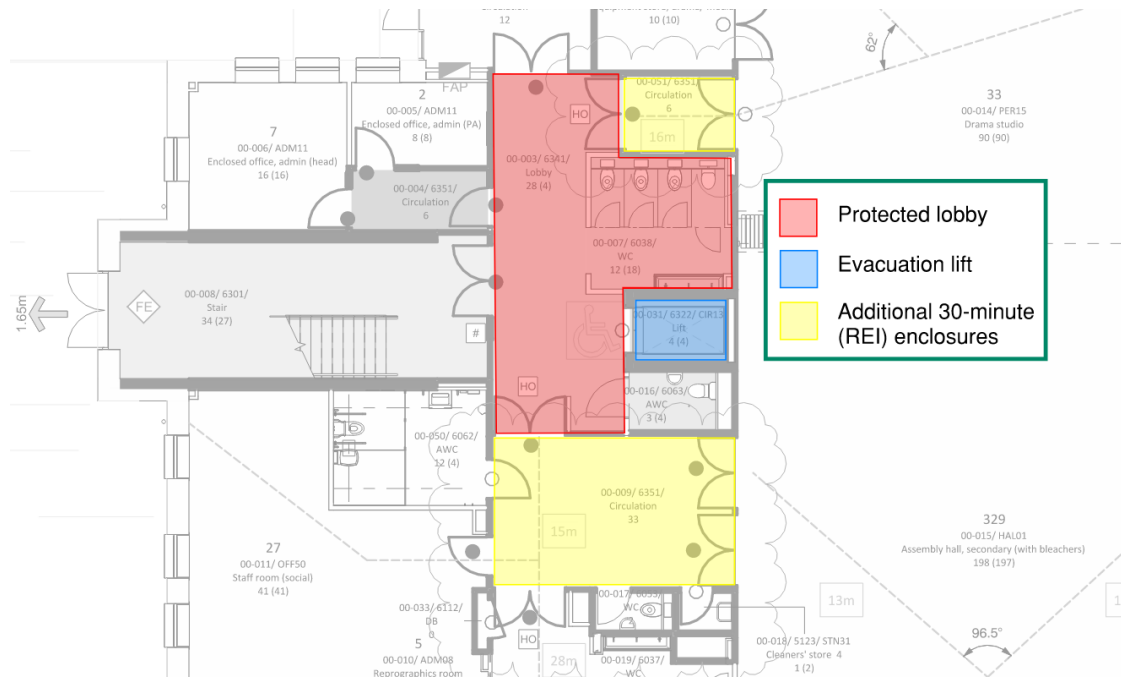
Ground Floor protected lobby to evacuation lift arrangement
